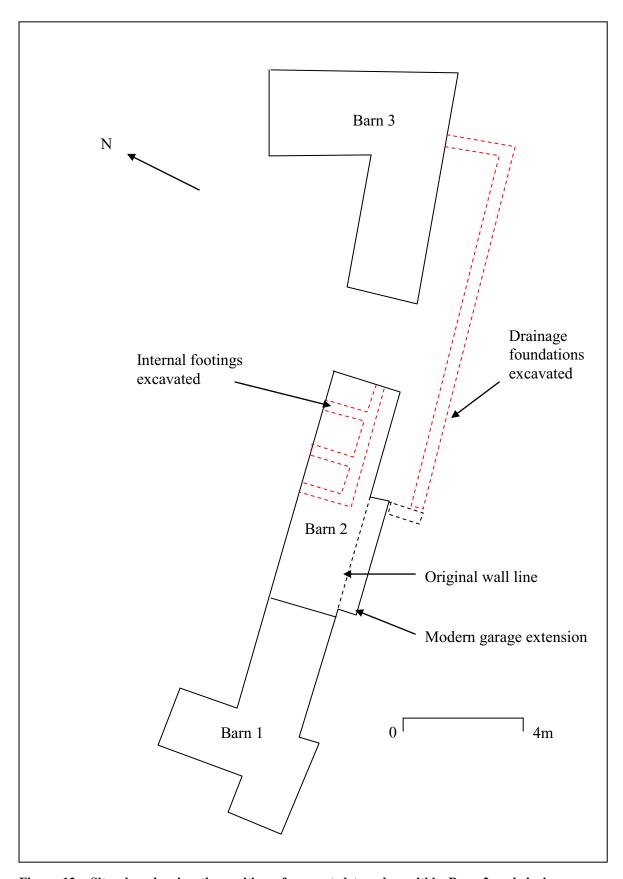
Site plan showing the position of excavated trenches within Barn 2 and drainage trenches to the south of the barns.
